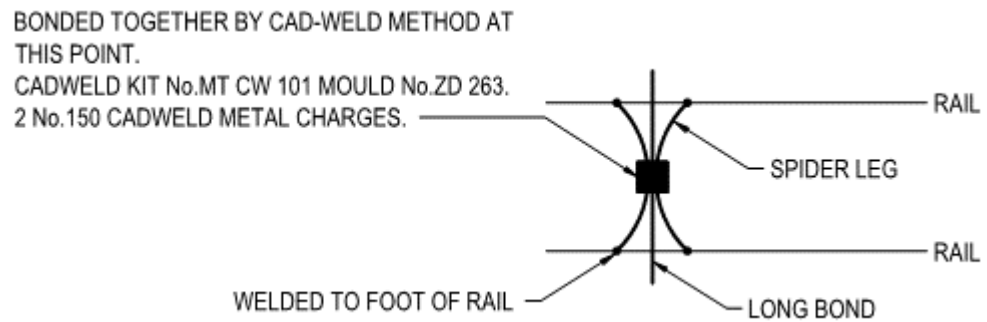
Duplicate Long Bonds Installation Detail.
